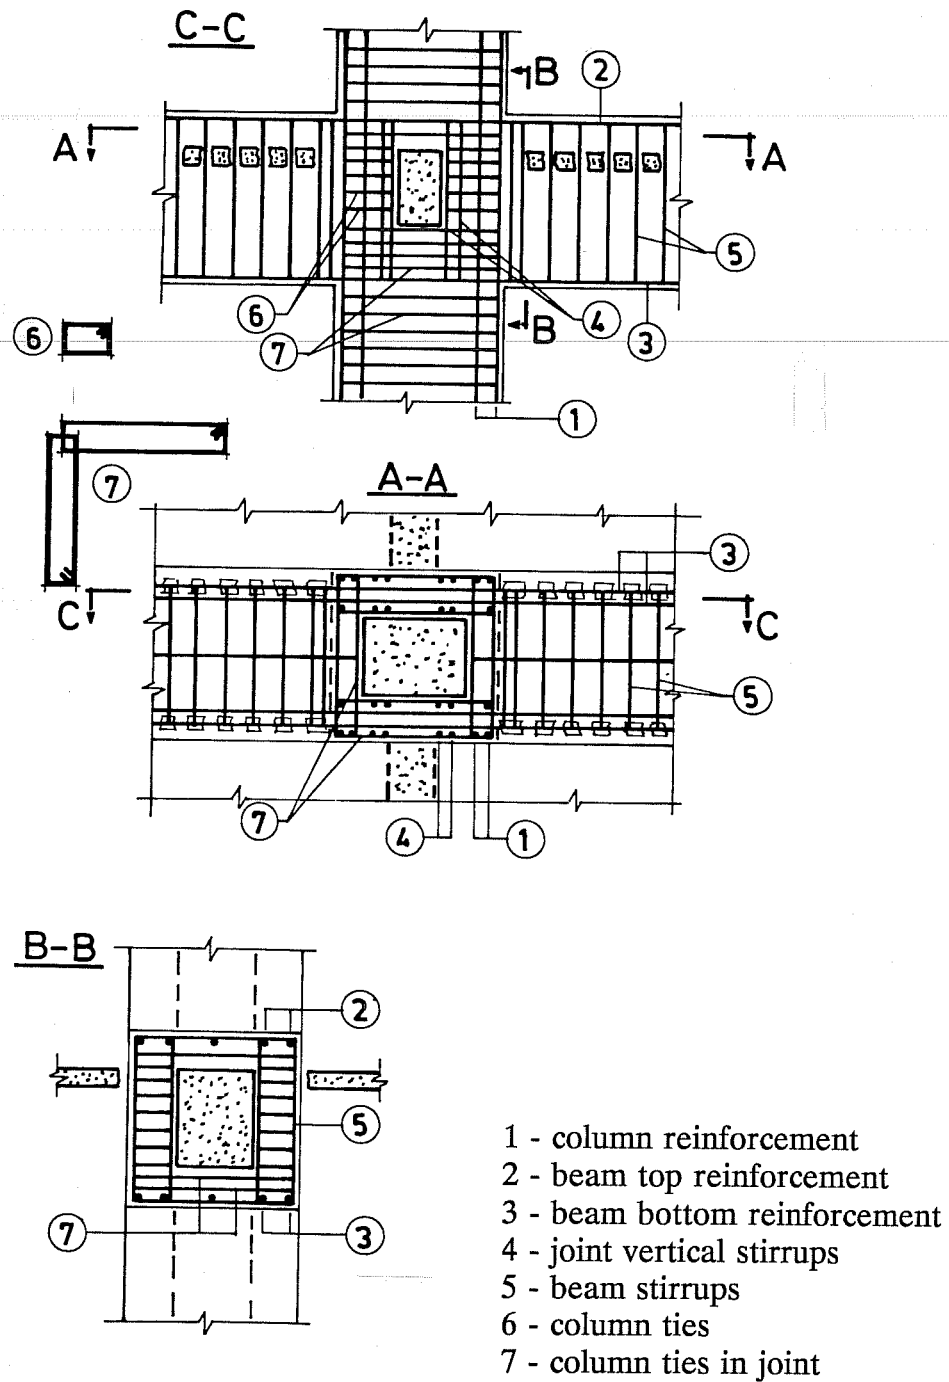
Jacketing of Beams, Columns and Joint (from Ref. 46).
